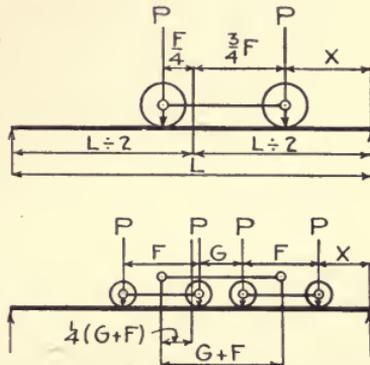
Position of Crane Truck for Maximum Moment in Runway Girder.
